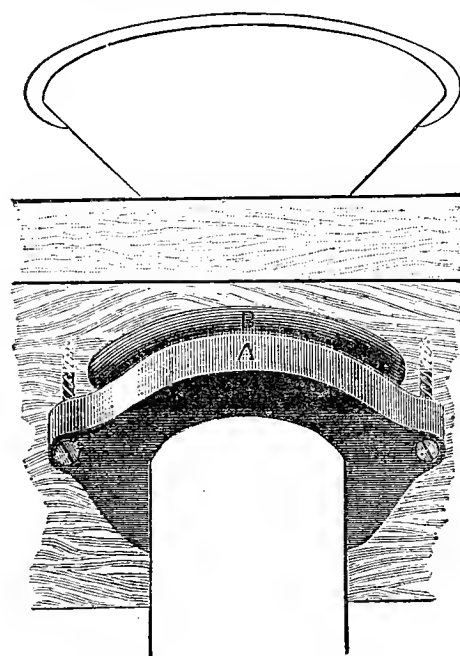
TUBE FIXER. A. socket, B. ring.
